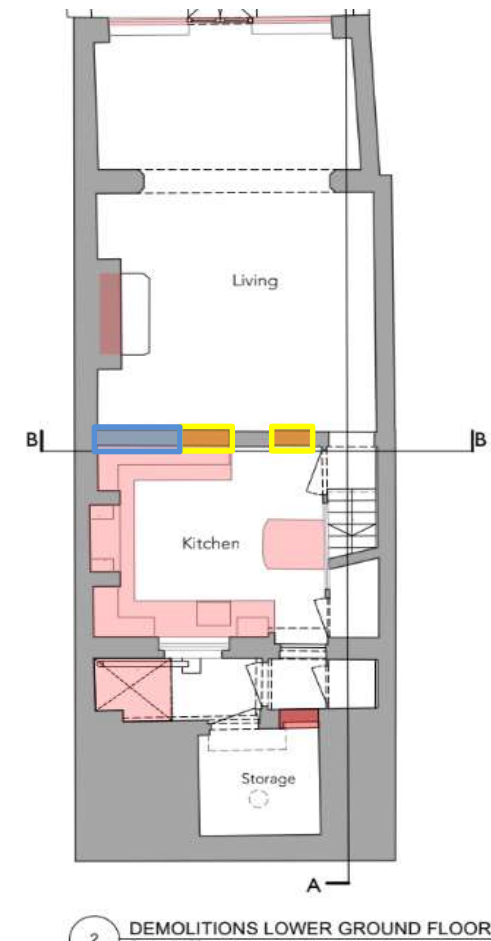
Lower Ground Floor Plan with proposed demolitions in red.
